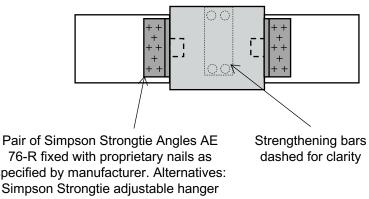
BRESSUMER A 220D X 250W ELEVATION
